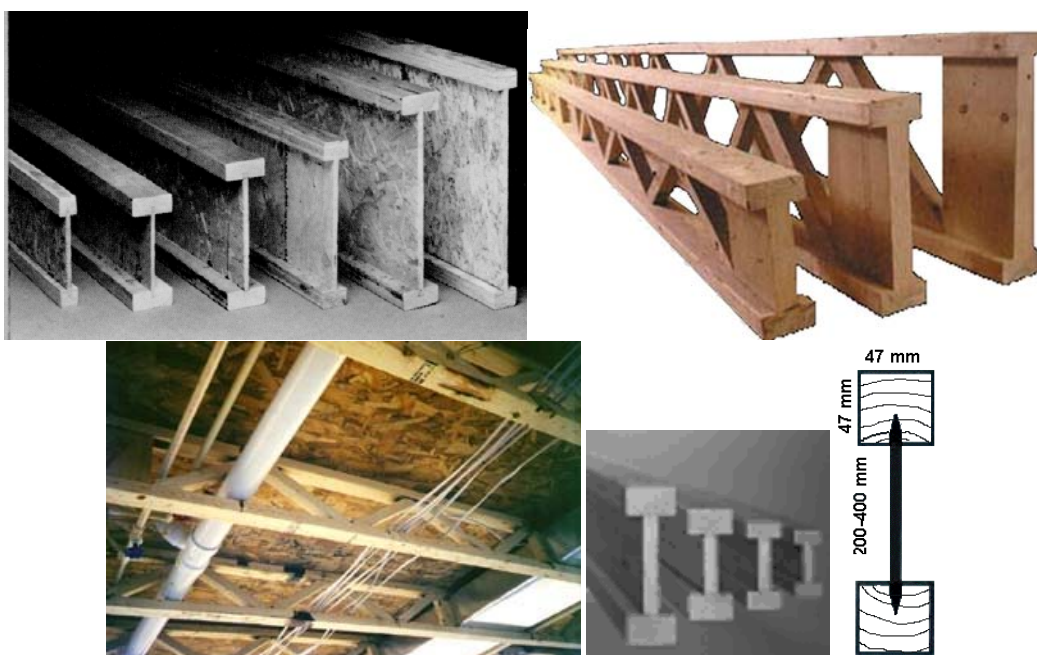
I-joists, open joists, solid wood I-beams and I-beam with fibreboard web
